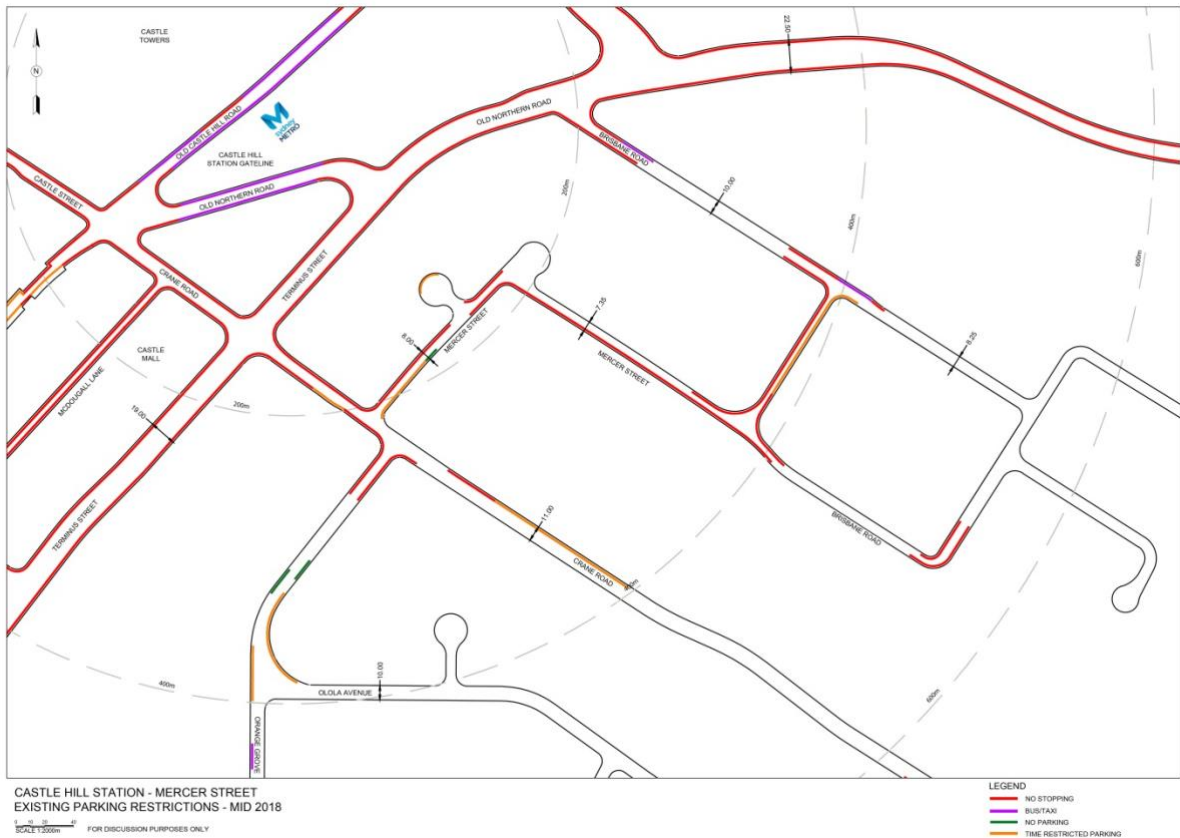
Pre-metro parking conditions mid-2018 – Brisbane Road, Crane Road and Mercer Street
